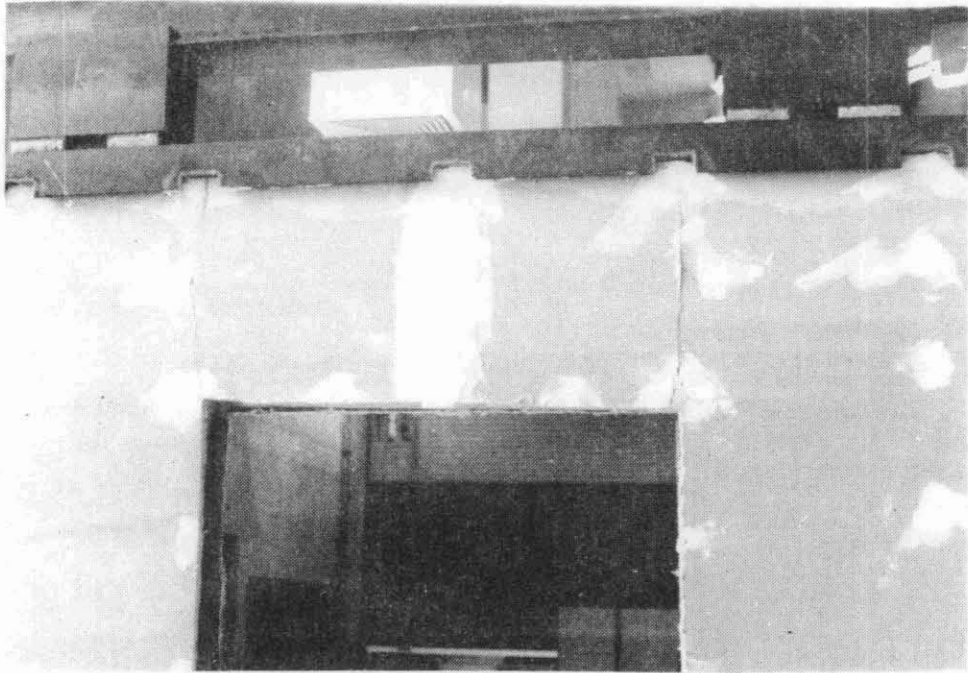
Partition Test Specimen P7: Typical Failure Above Door Opening (Rear View)
